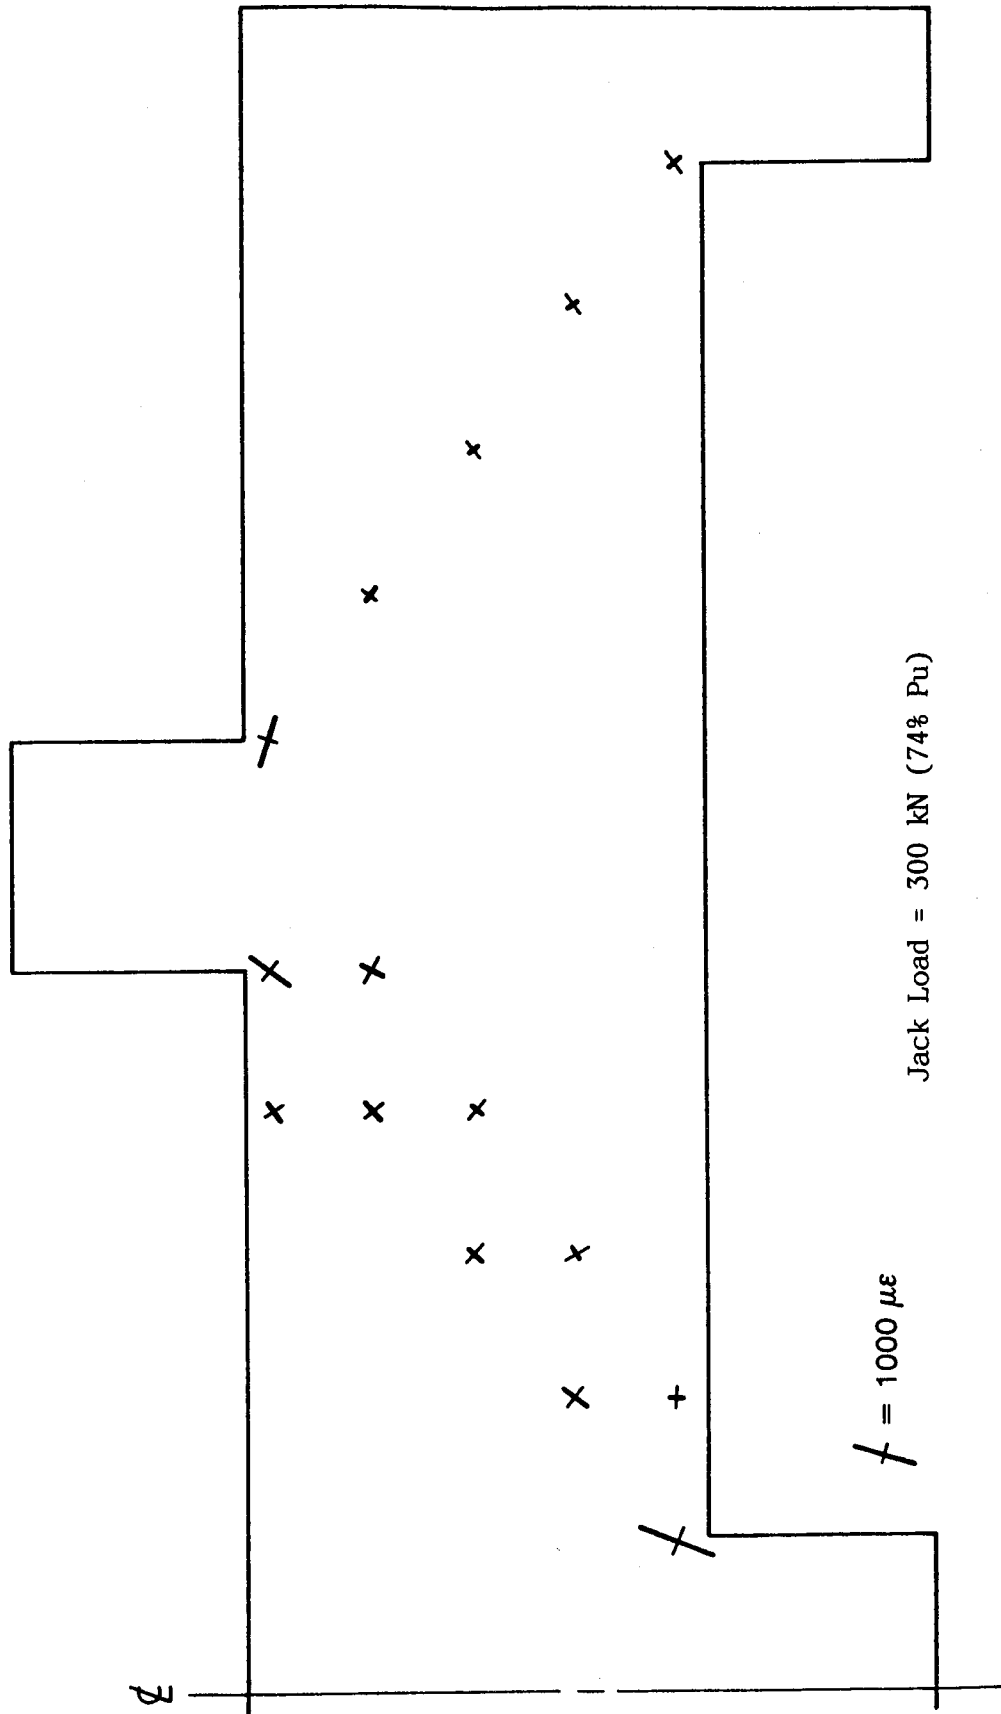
Beam 6/1.5 Concrete Compressive Strains
